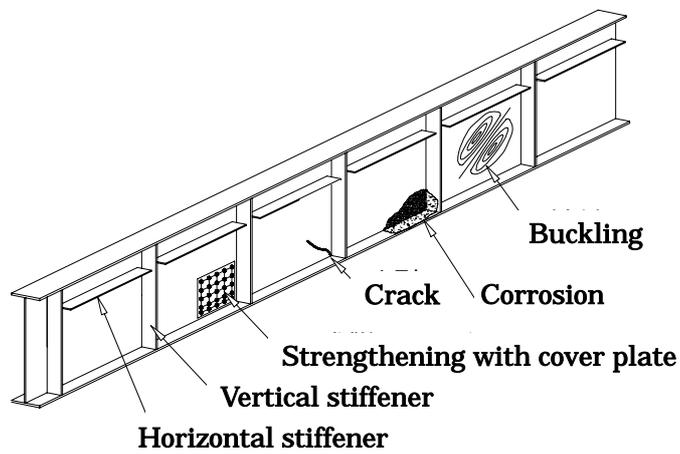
Damage of the steel I-girder bridge and the Strengthening(Repair).
